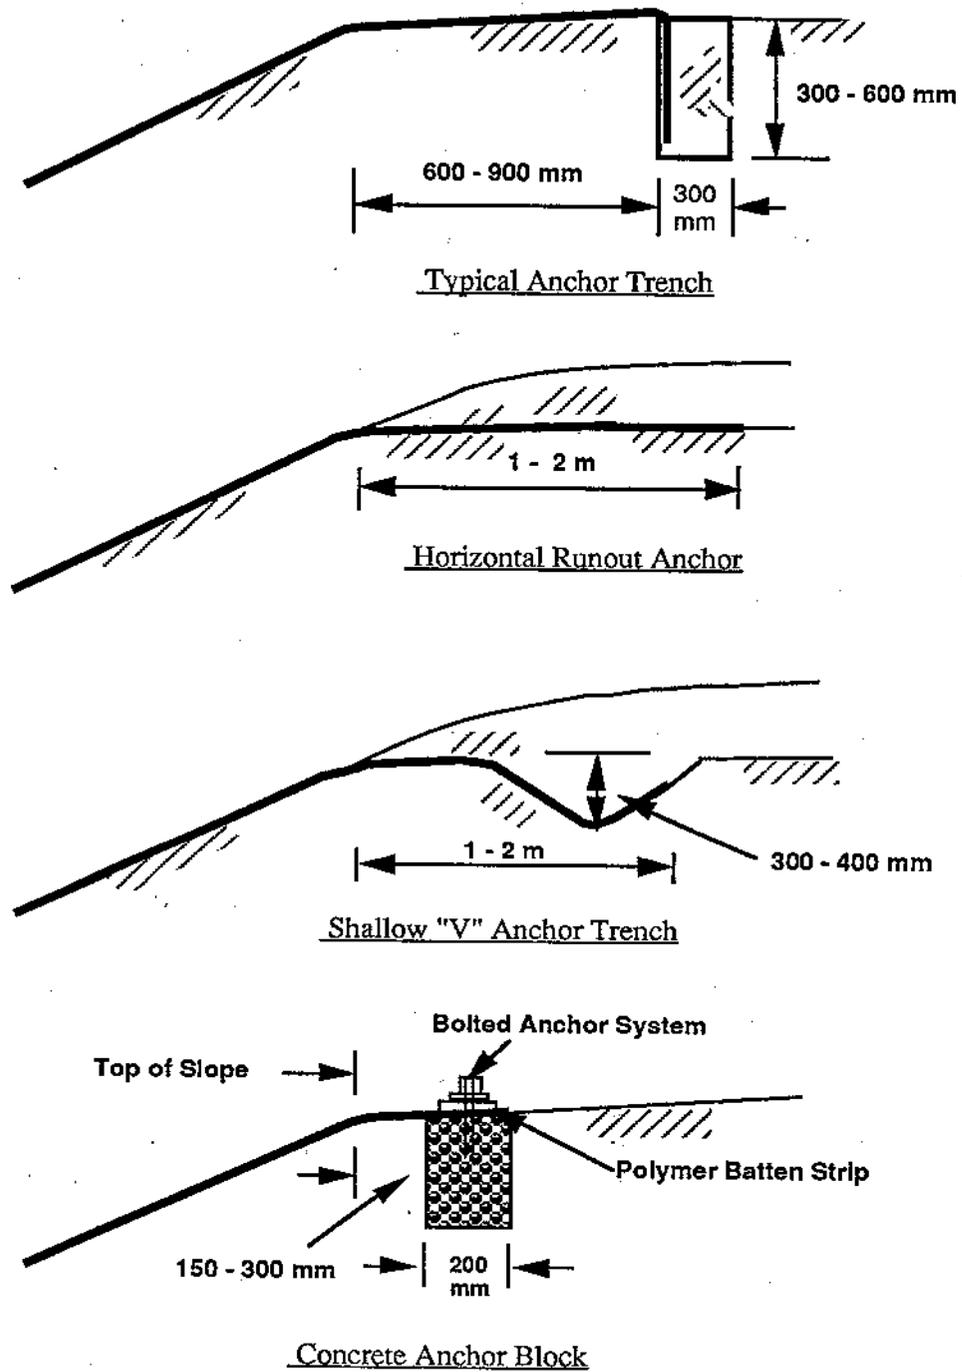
Various Types of Geomembrane Anchors Trenches (Dimensions are Typical and for Example Only).
